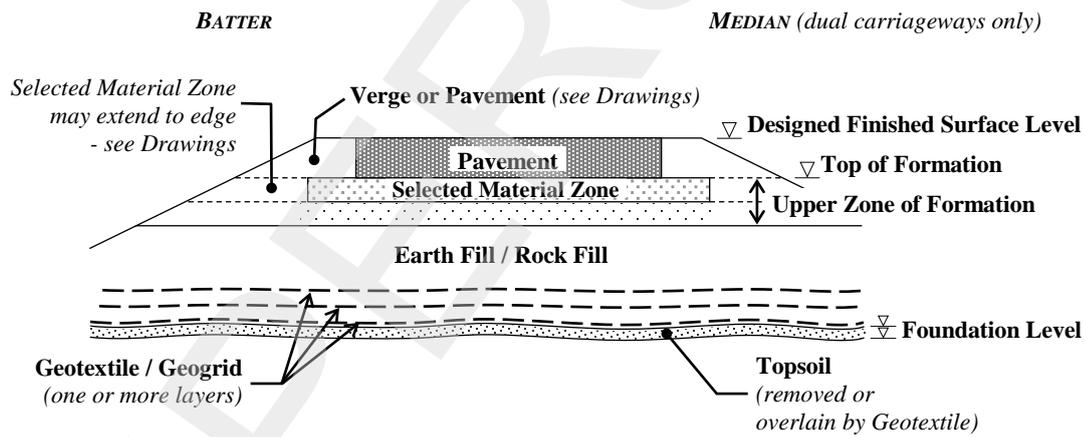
(d) – Embankment Foundation Treatment Type E4 – Geotextile/Geogrid Layer(s)
